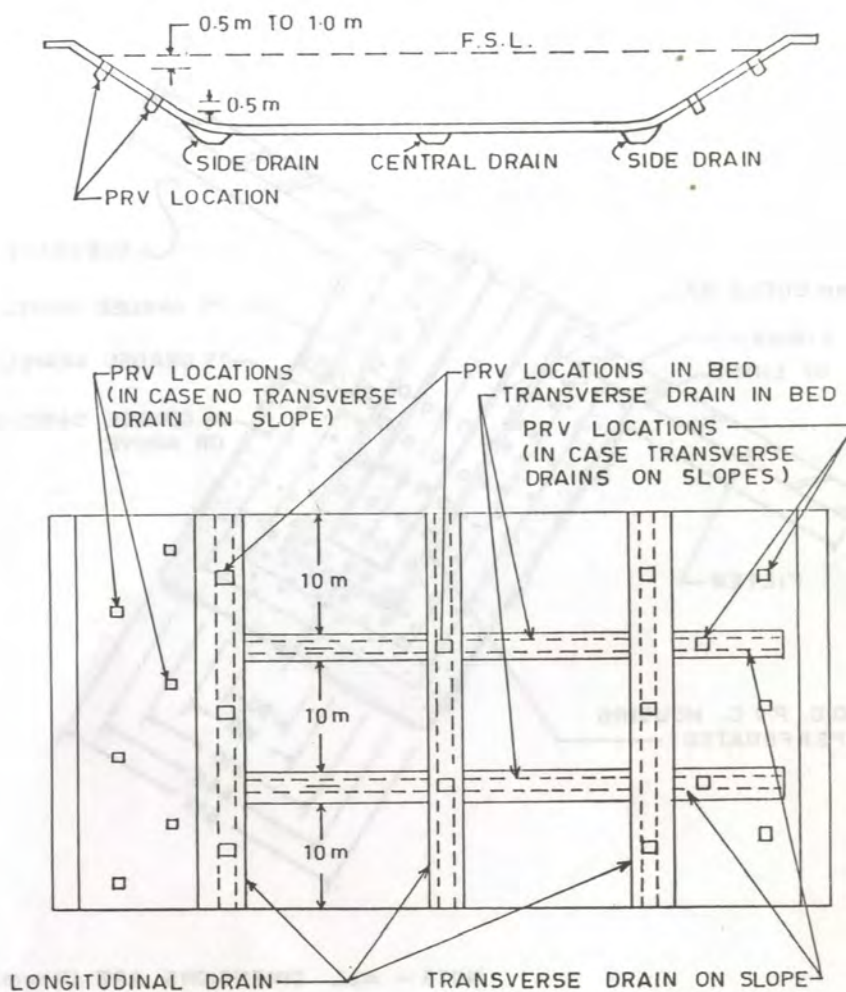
ARRANGEMENT SHOWING DRAINS AND P.R.V. LOCATIONS.
